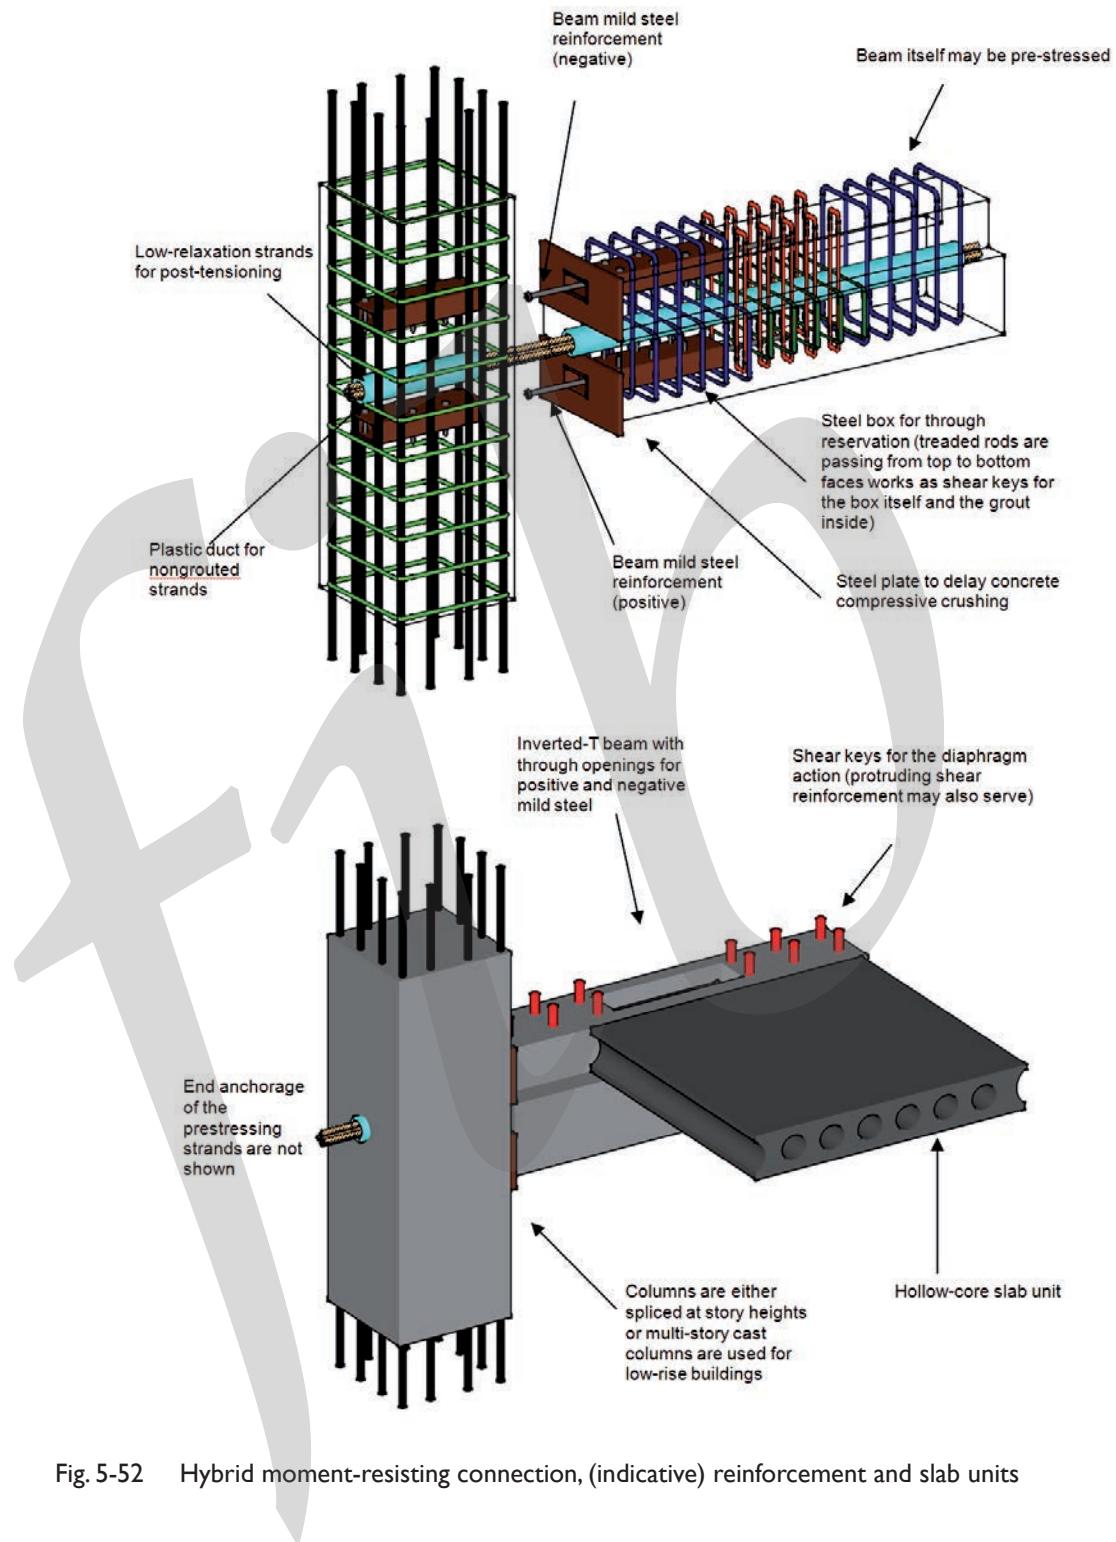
Hybrid moment-resisting connection, (indicative) reinforcement and slab units
